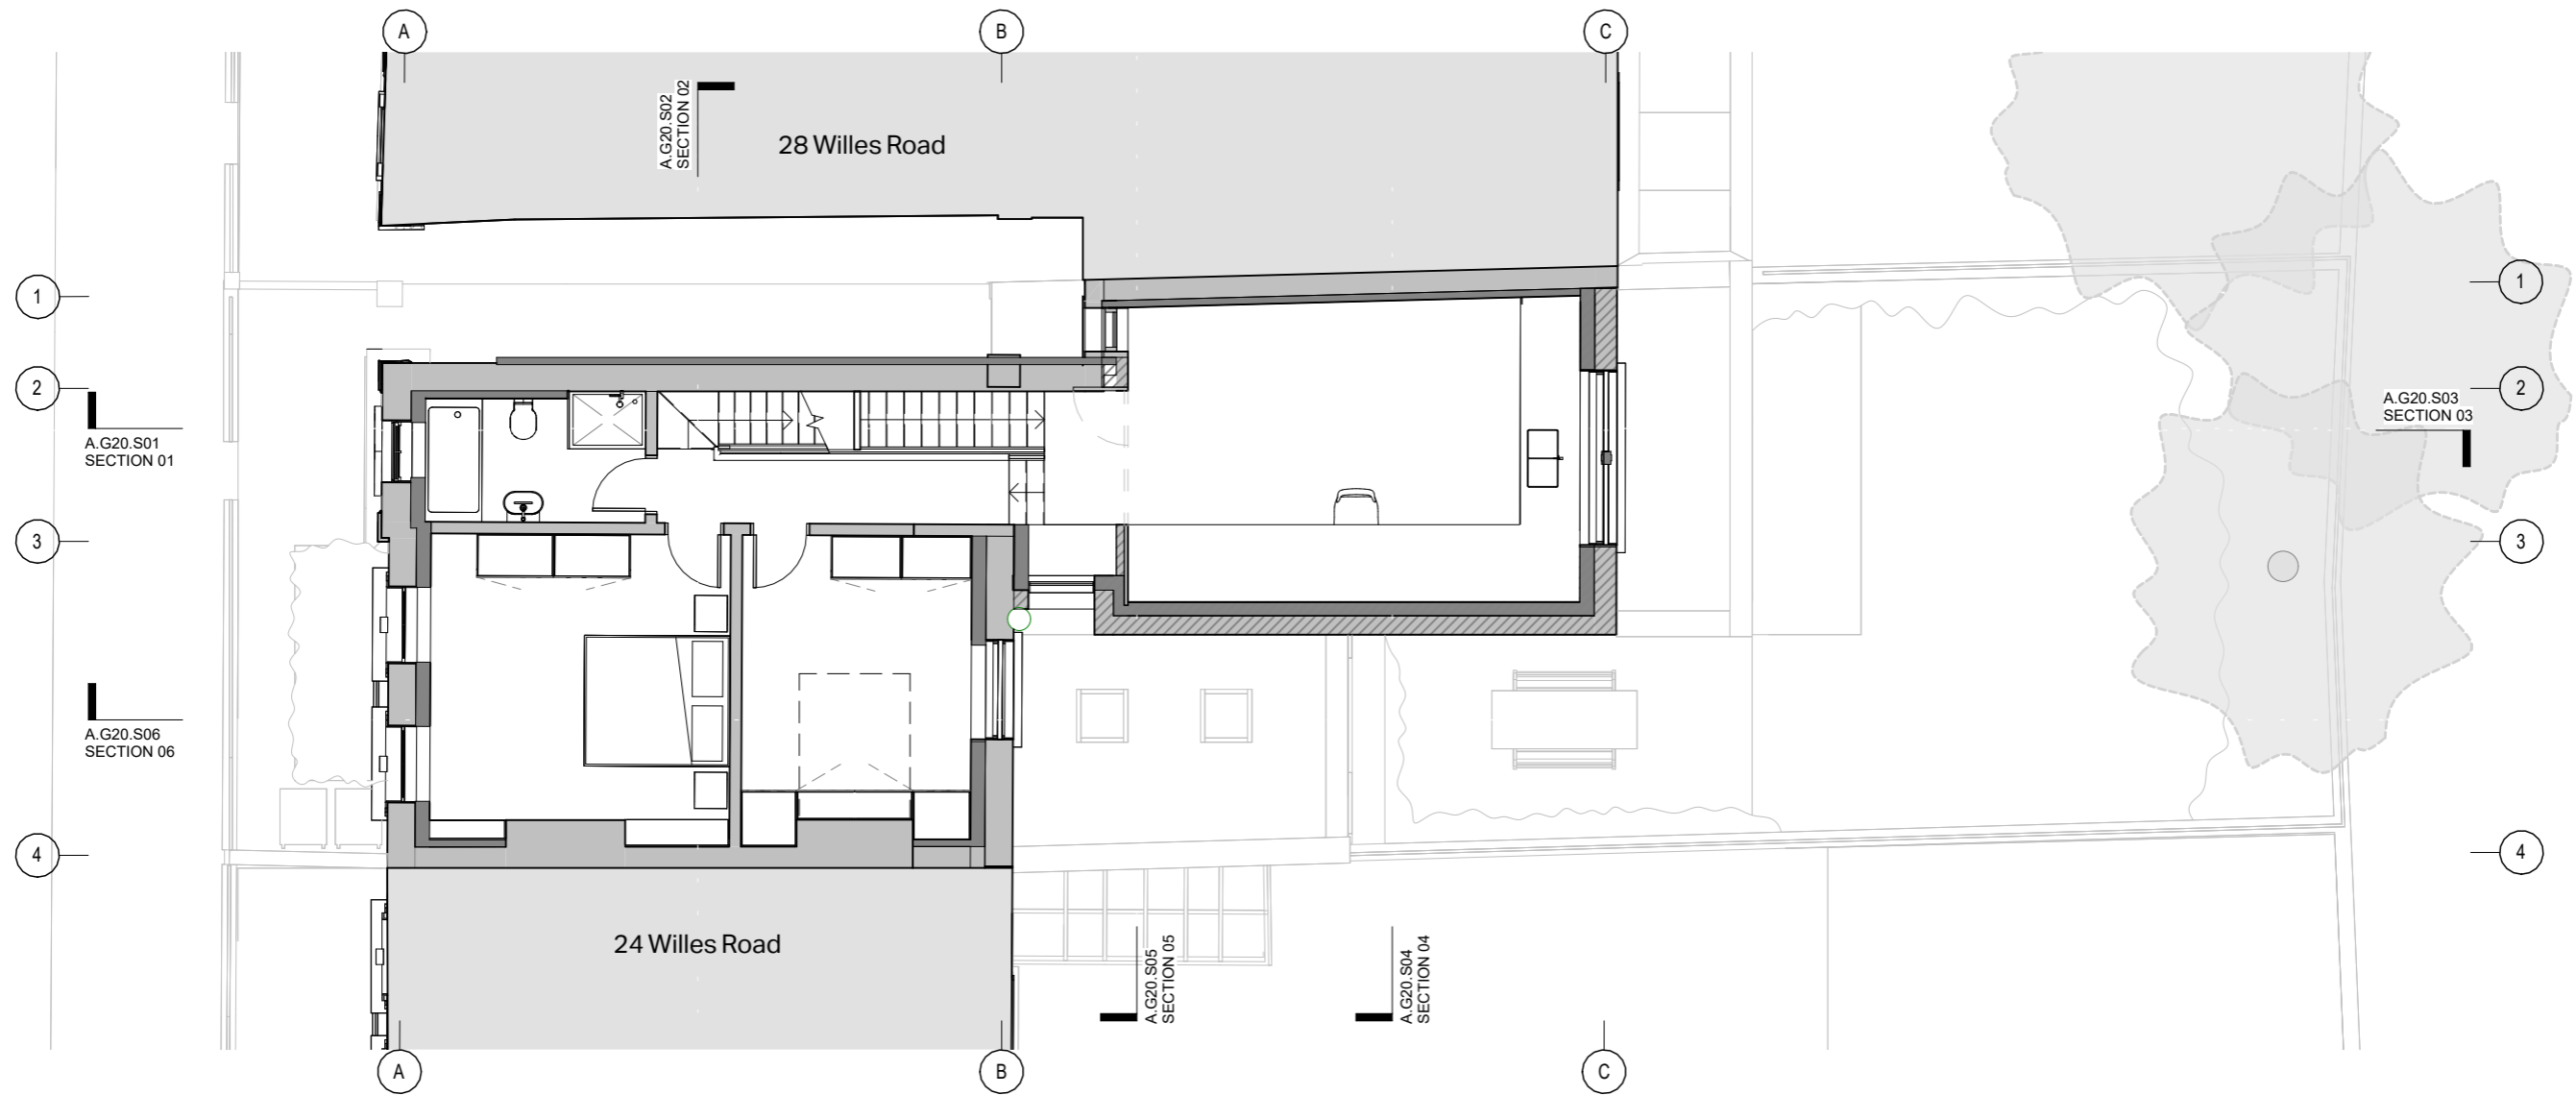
Proposed Ground Floor Plan, 1:100 @A3
